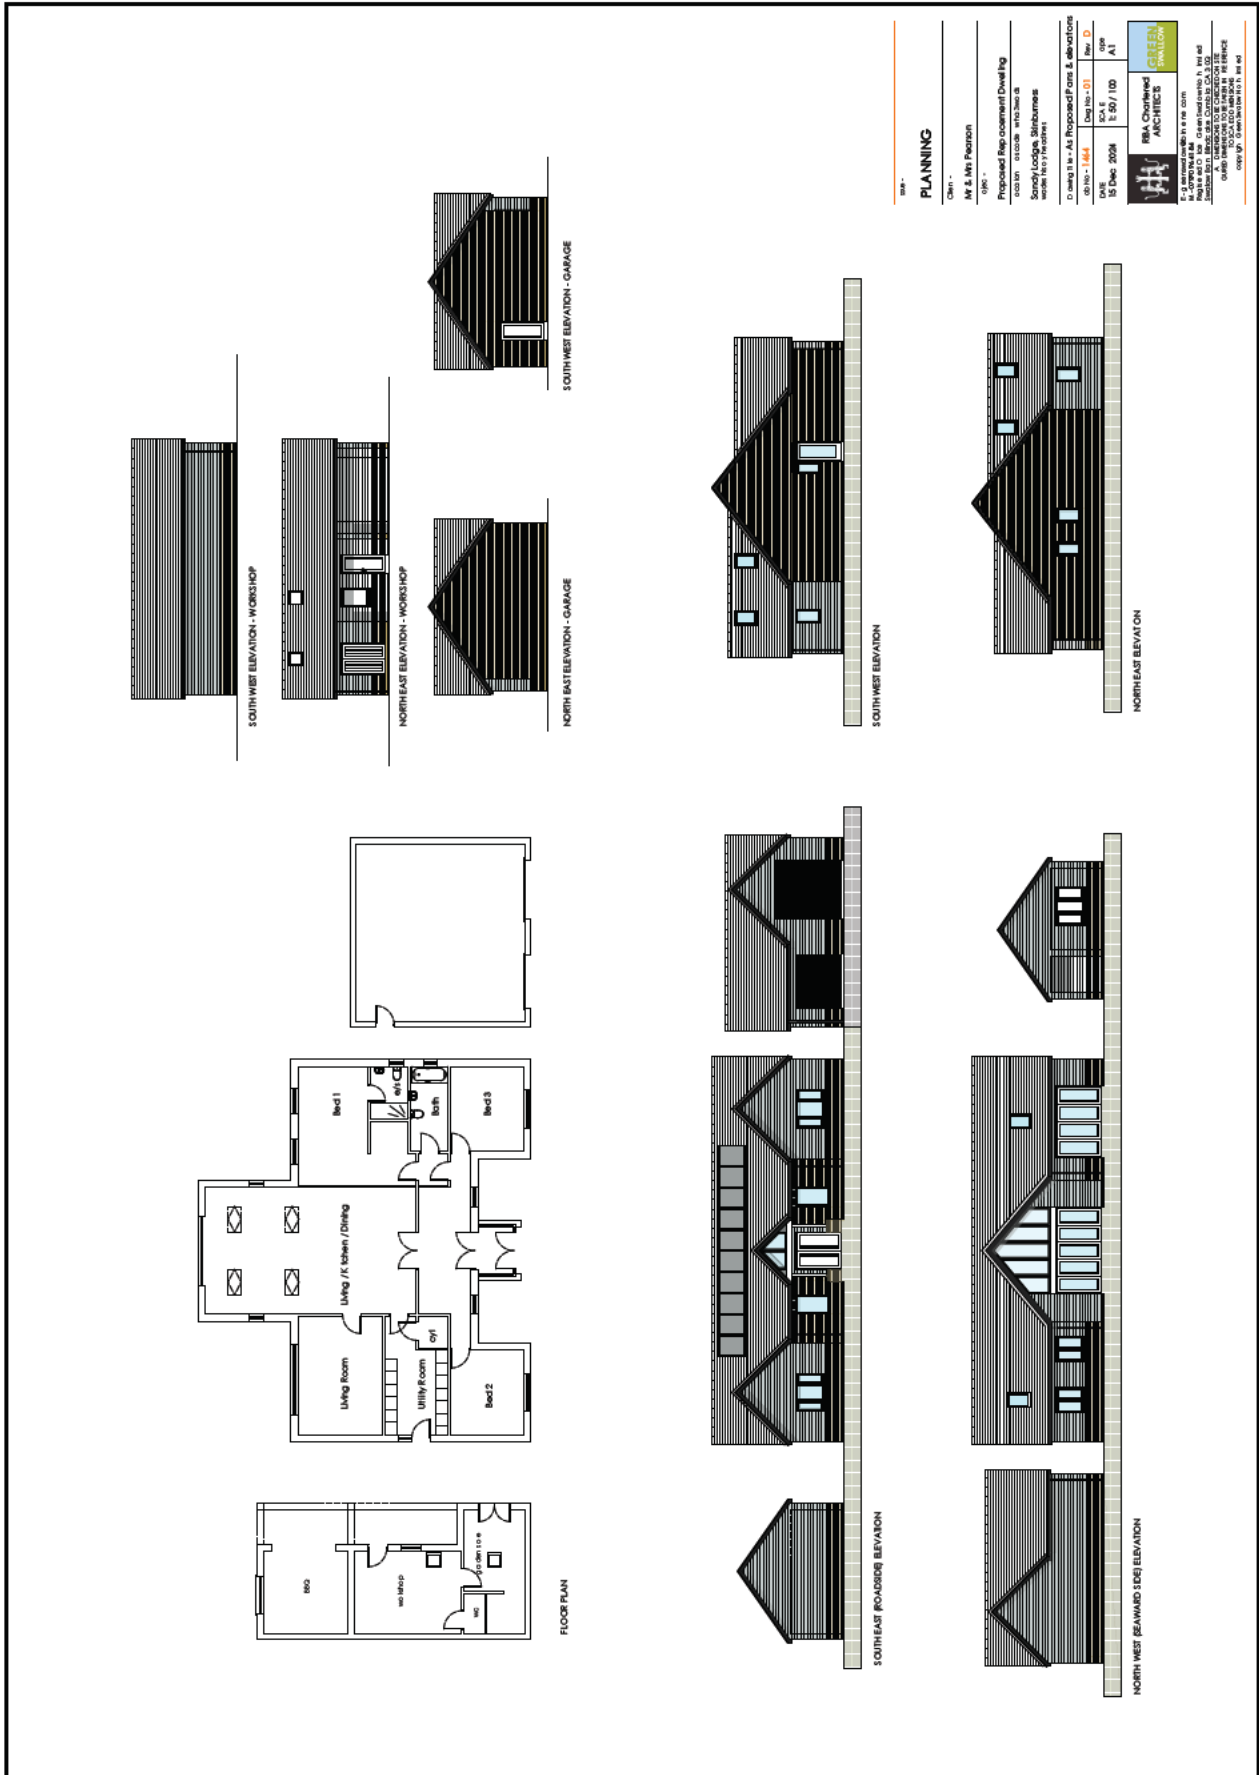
Proposed Replacement Dwelling - Sandy Lodge, Skinburness; As Proposed Plans and Elevations. Drawing No. 1464 01 D., by Green Swallow North Ltd.
